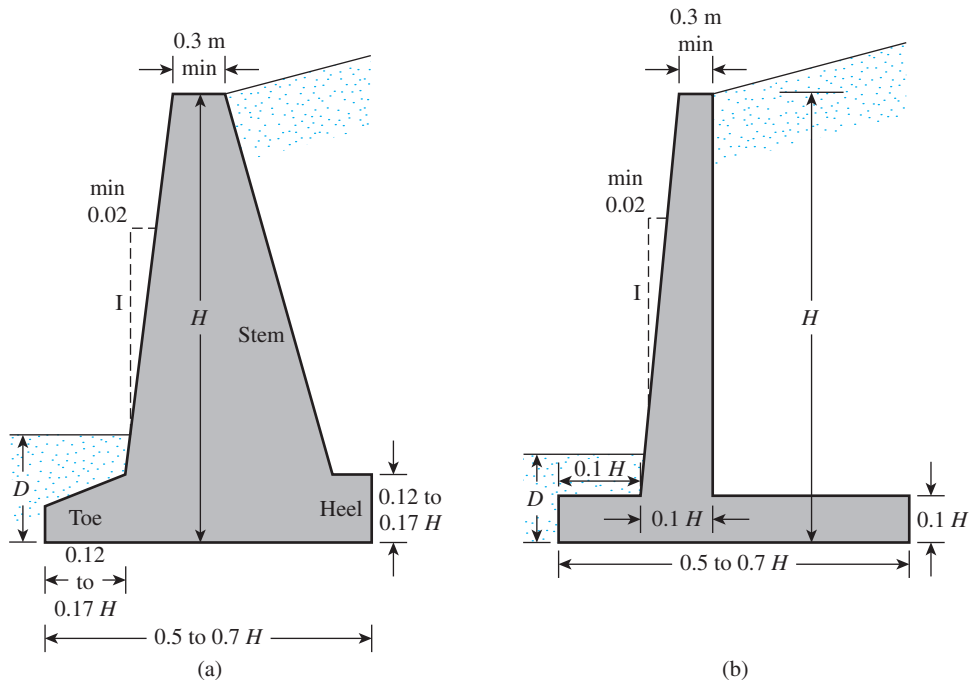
Approximate dimensions for various components of retaining wall for initial stability checks: (a) gravity wall; (b) cantilever wall
